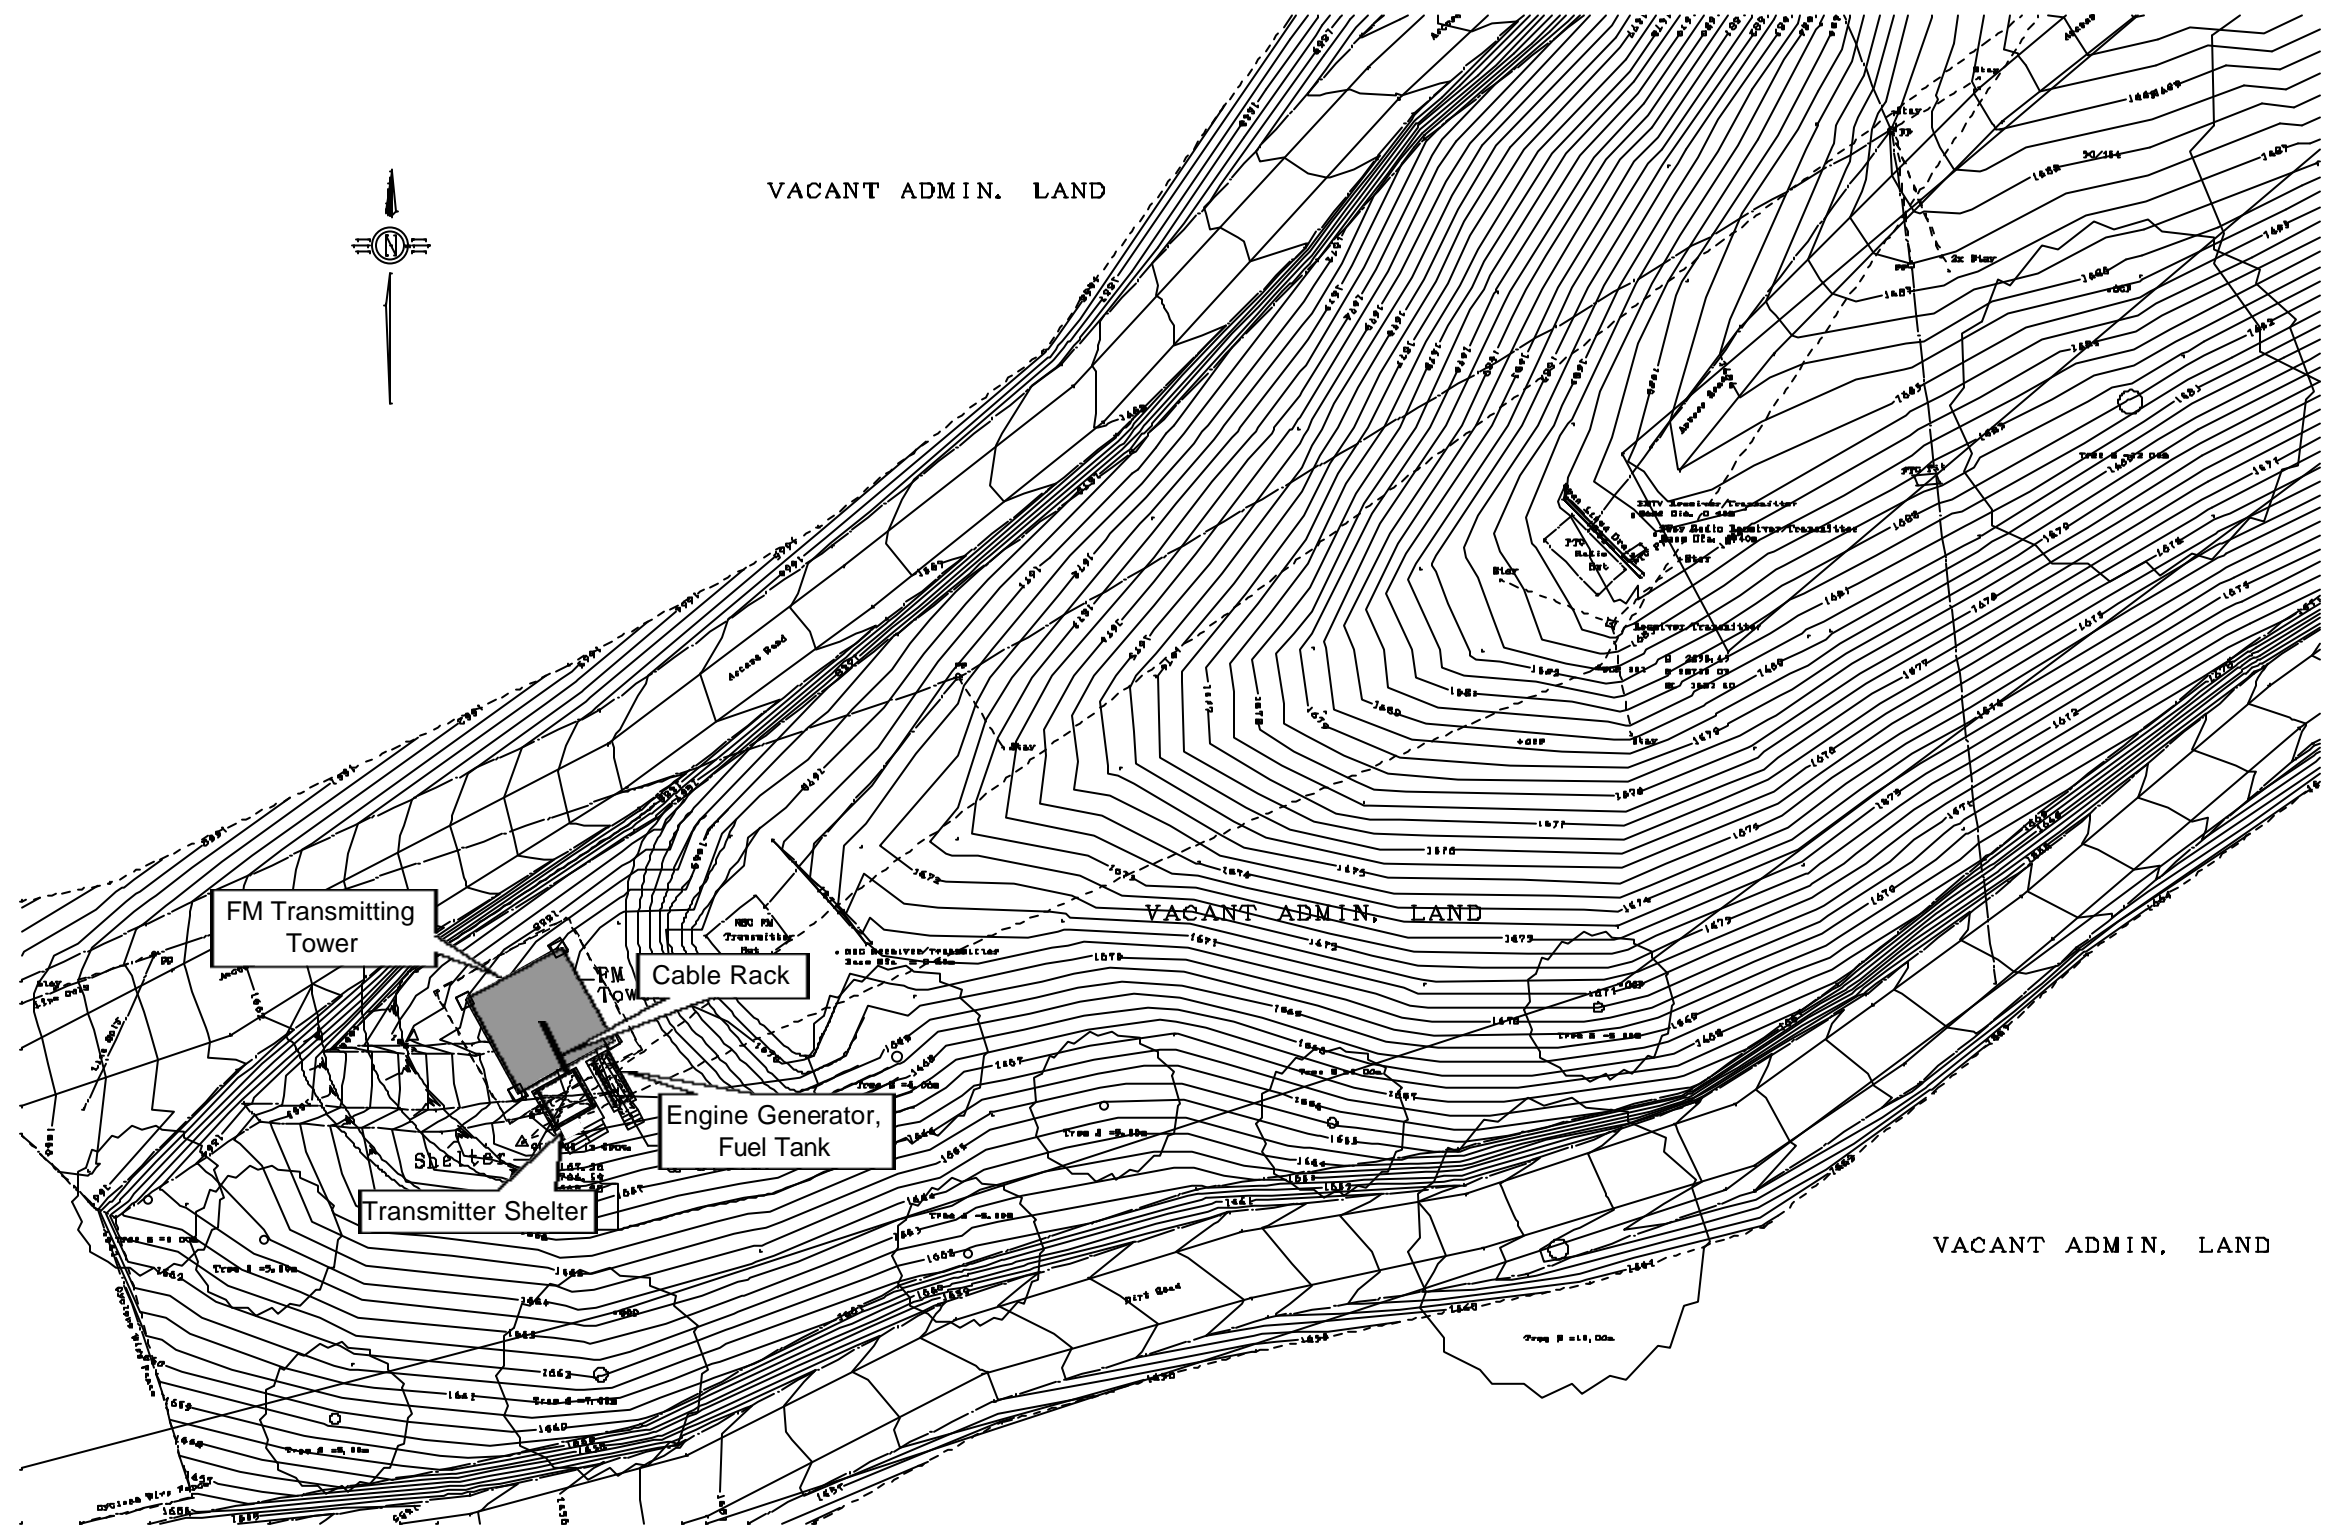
Goroka FM Radio Station	Site Layout of FM Transmitting Station	S=1:500
